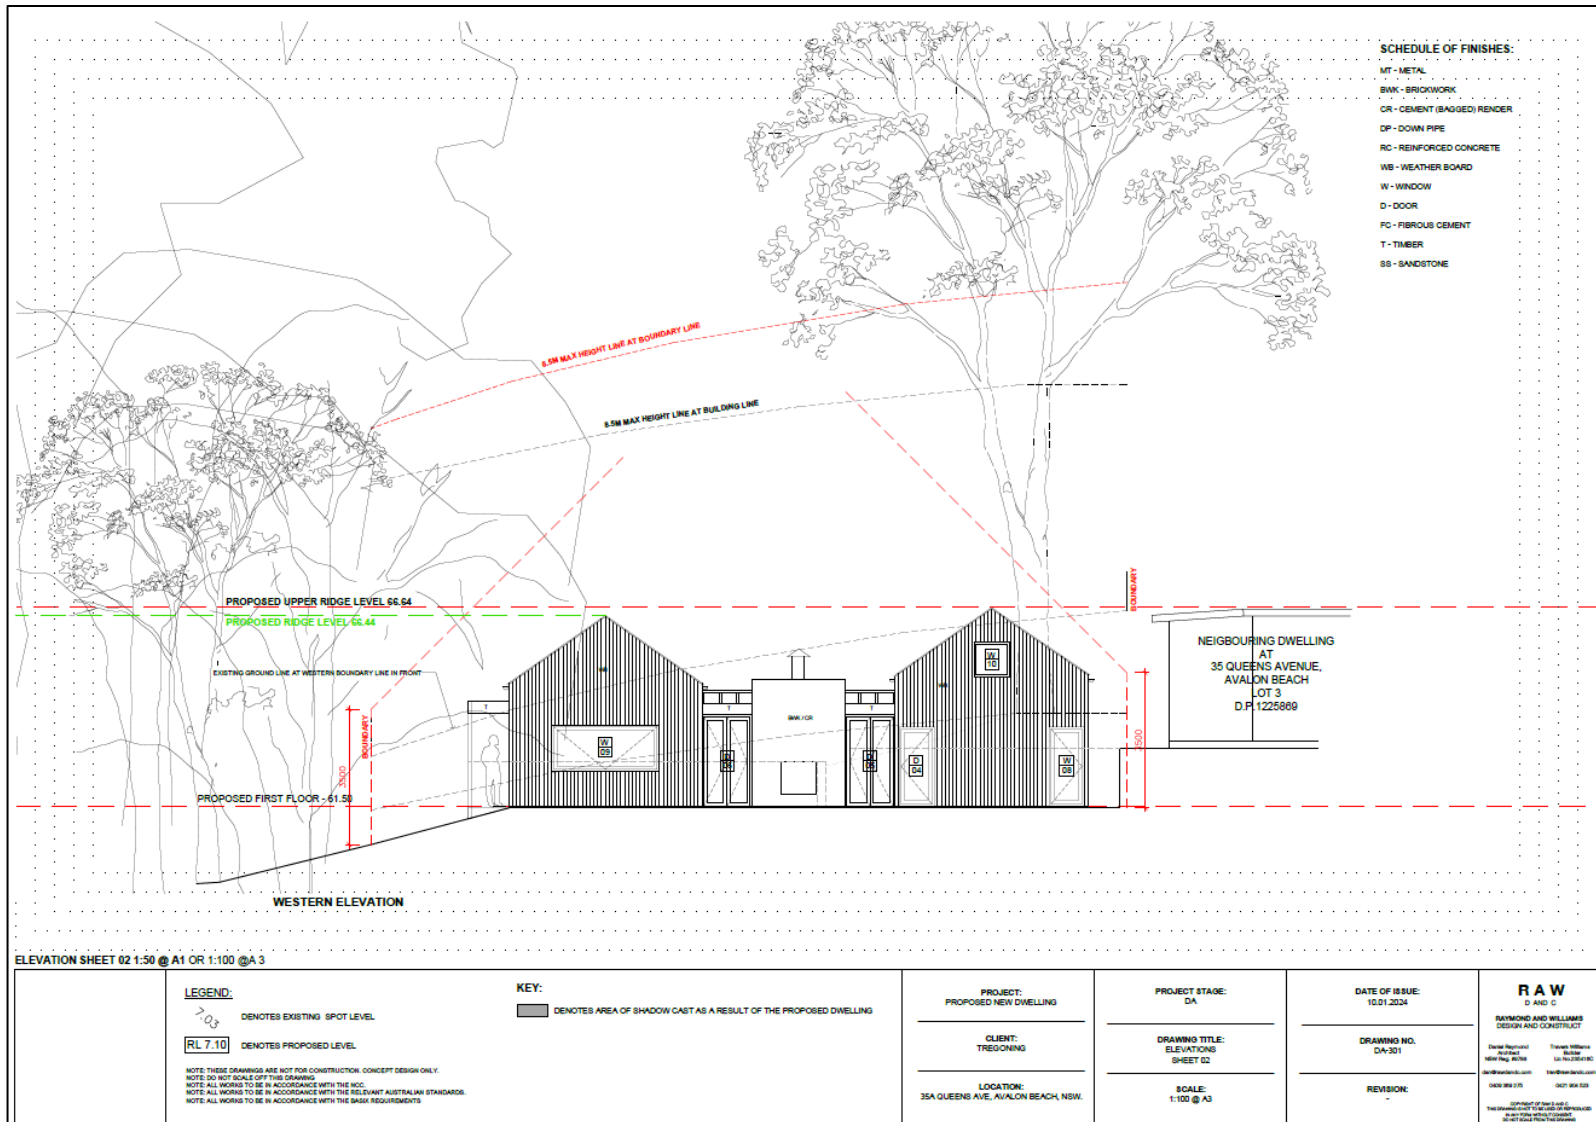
ILLUSTRATES PROPOSED WESTERN ELEVATION
